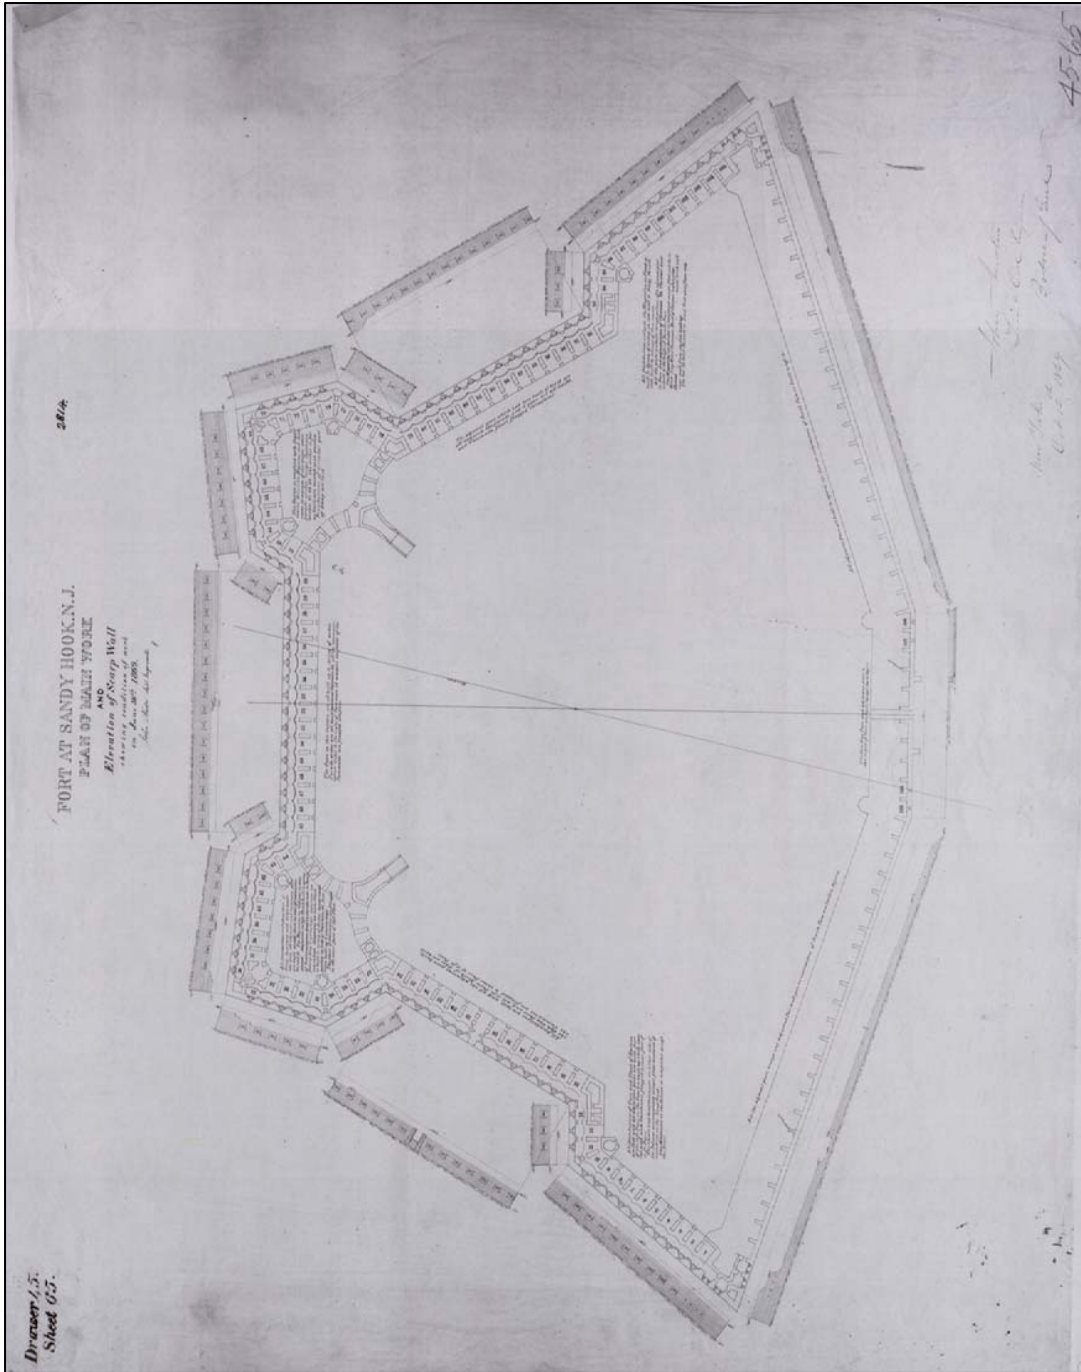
"Fort at Sandy Hook, N. J." Plan of main work and elevation of scarp wall, showing condition of work on June 30, 1869.
